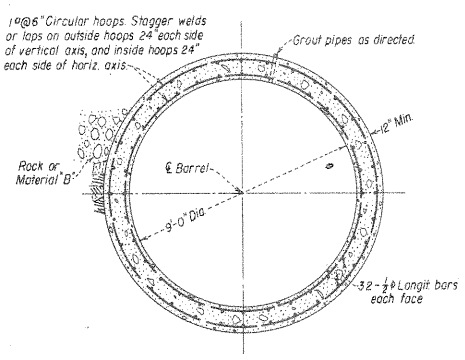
Reinforcement steel in tunnel section at station 20+50.
